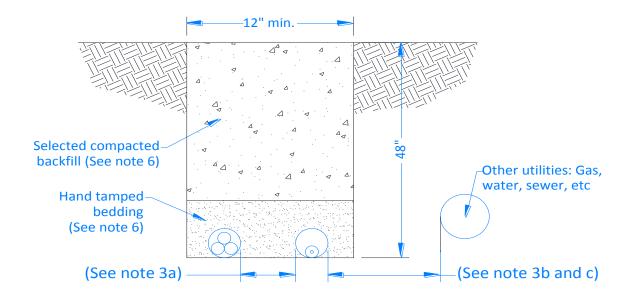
TRENCH AND CONDUIT FOR ELECTRIC UNDERGROUND SERVICE
